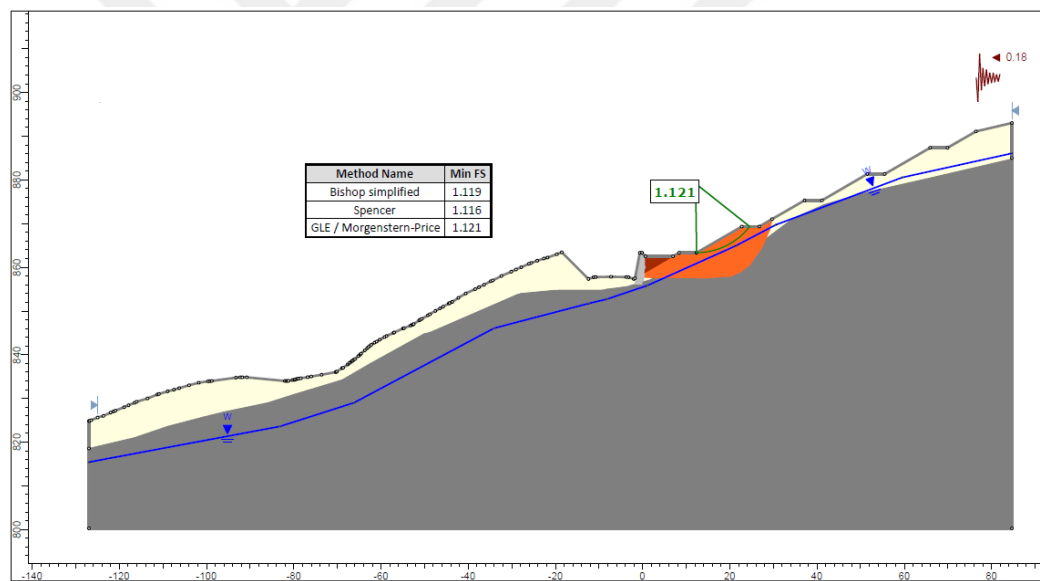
Final remedial design for Section A-A incorporating a 30° slope with a stone masonry retaining wall, achieving target safety factors under pseudo-static ($k_h = 0.18g$) conditions (FS=1.121)
